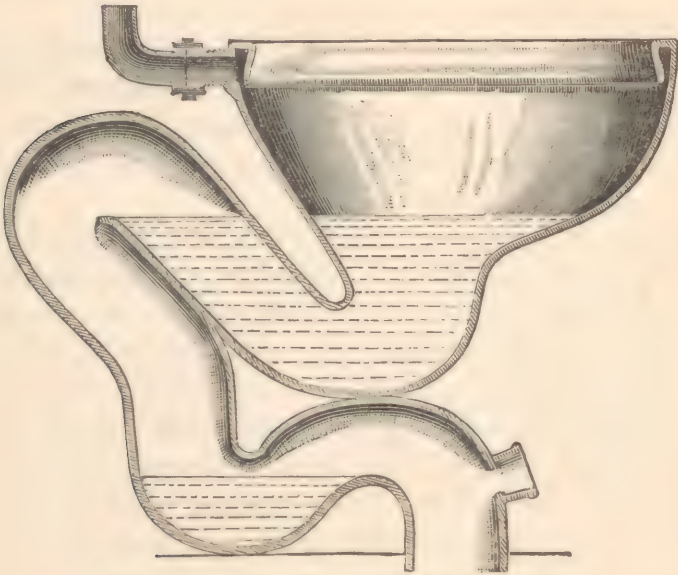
SECTIONAL VIEW OF "A. G. M." CLOSET.
